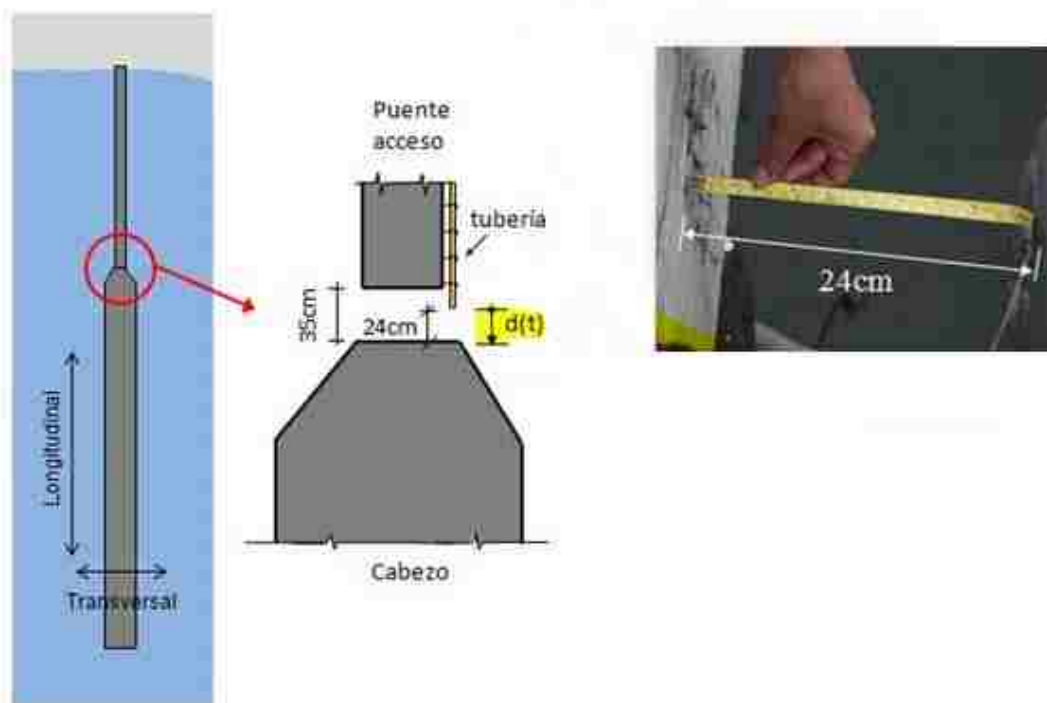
Separation of the Approach Zone and Berthing Zone at the South Pier (Photo from Eduardo Miranda)
